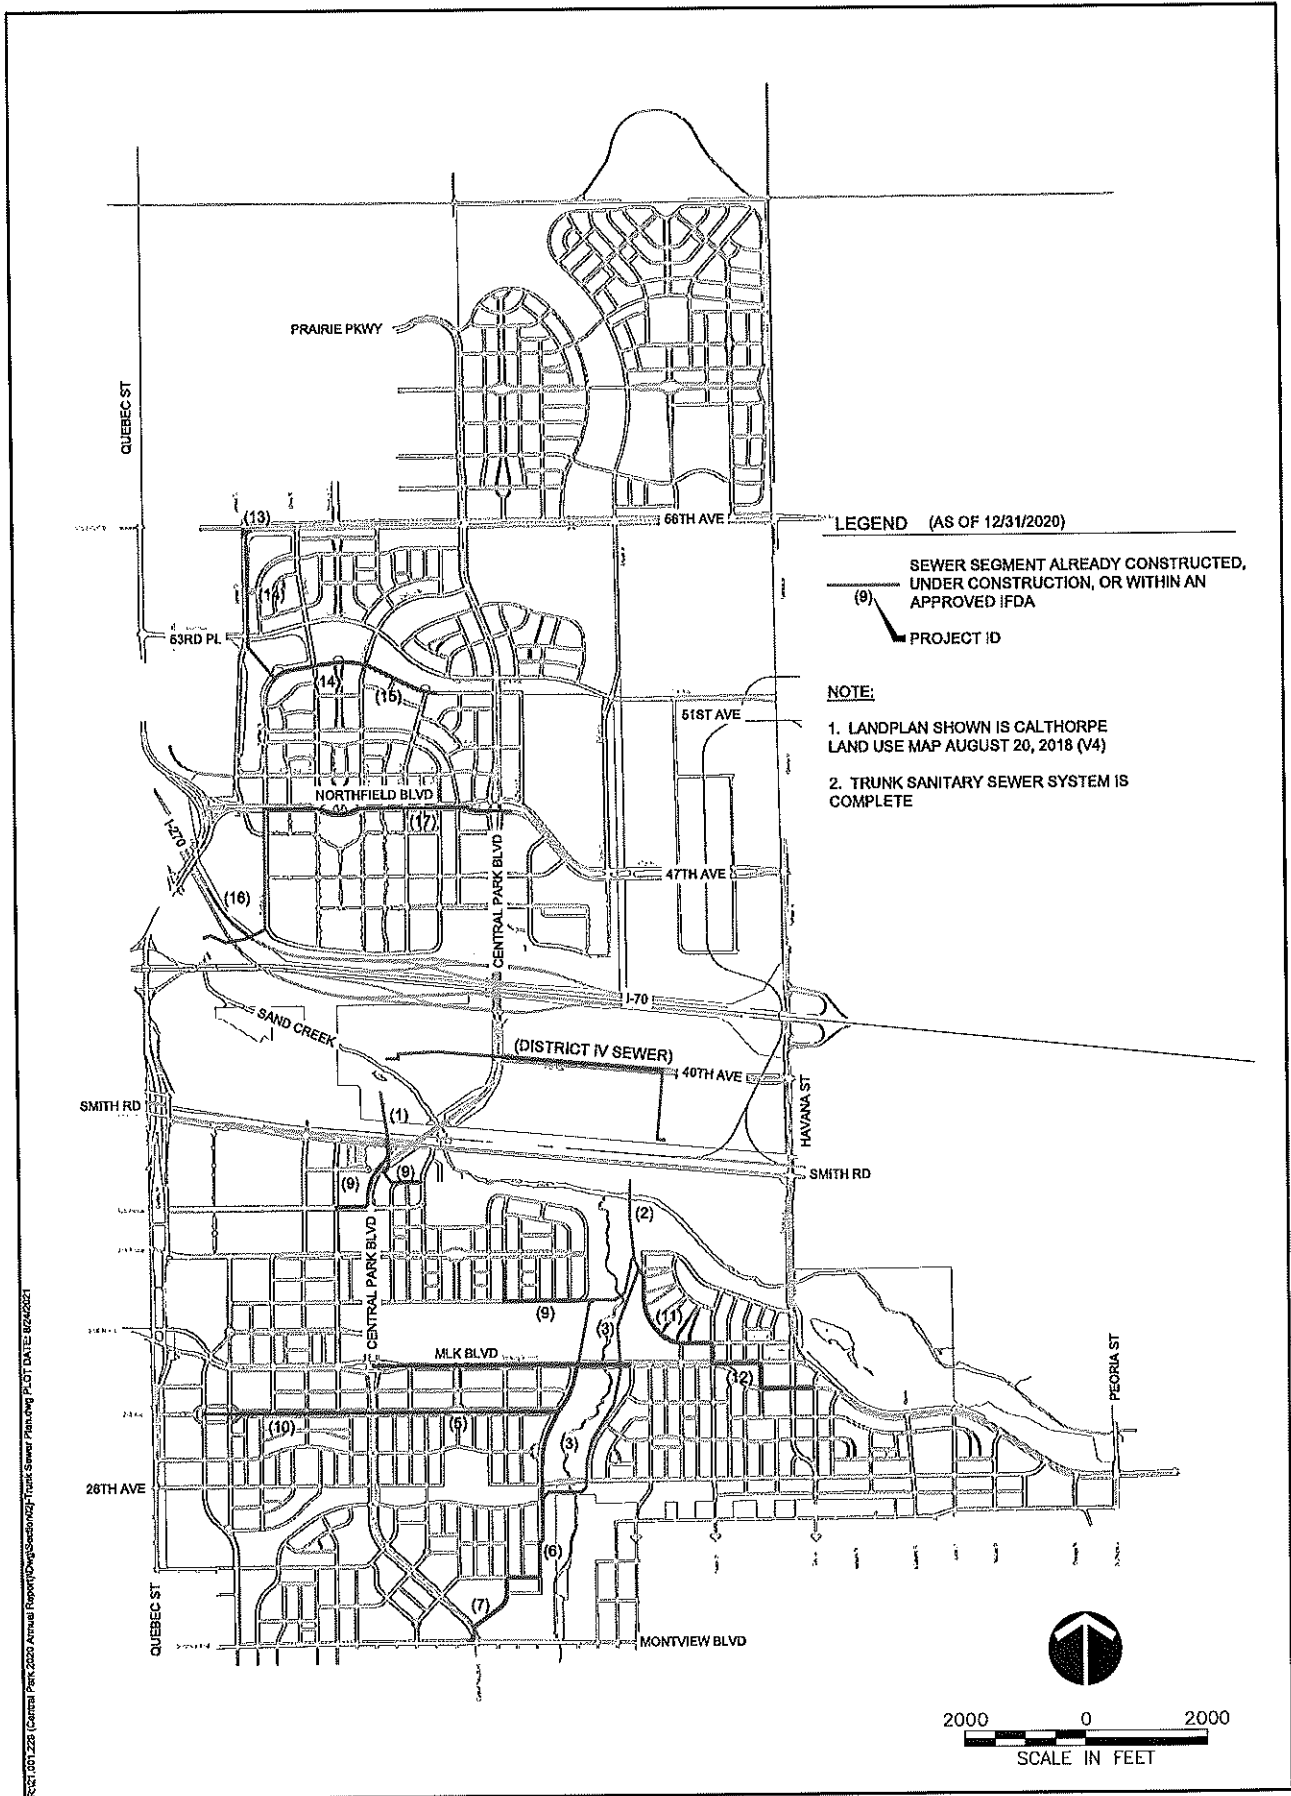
Stapleton Trunk (Non-Park) Drainage Plan
